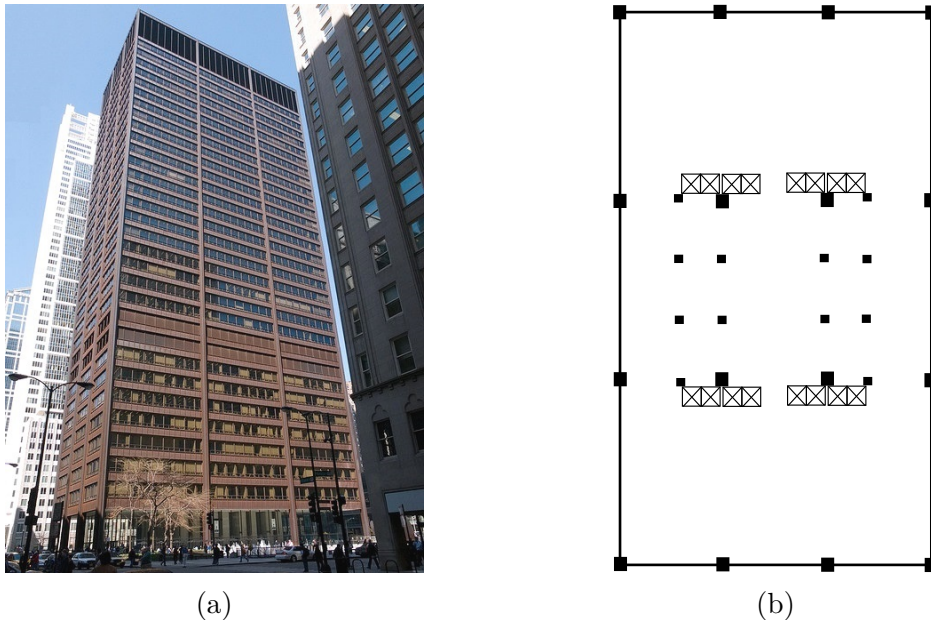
Daley Center. (a) Exterior view; (b) Typical floor plan (web source)
